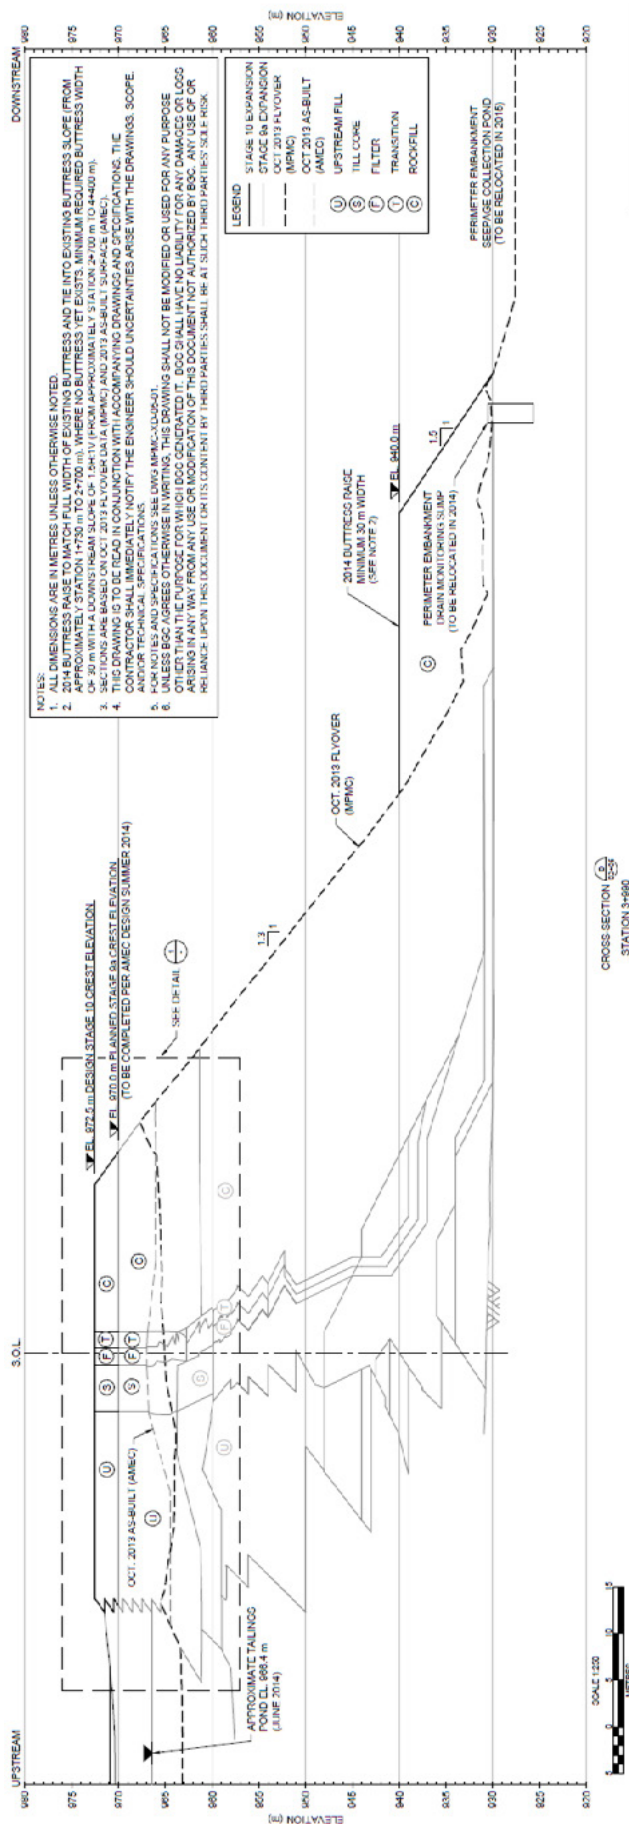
Stage 10 PE Section Plan BGC Engineering Inc. (2014) Dwg. MPMC-XD-03-02
